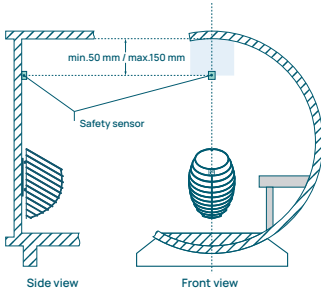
Installing the safety sensor on the wall in barrel saunas: wall-mounted heater
